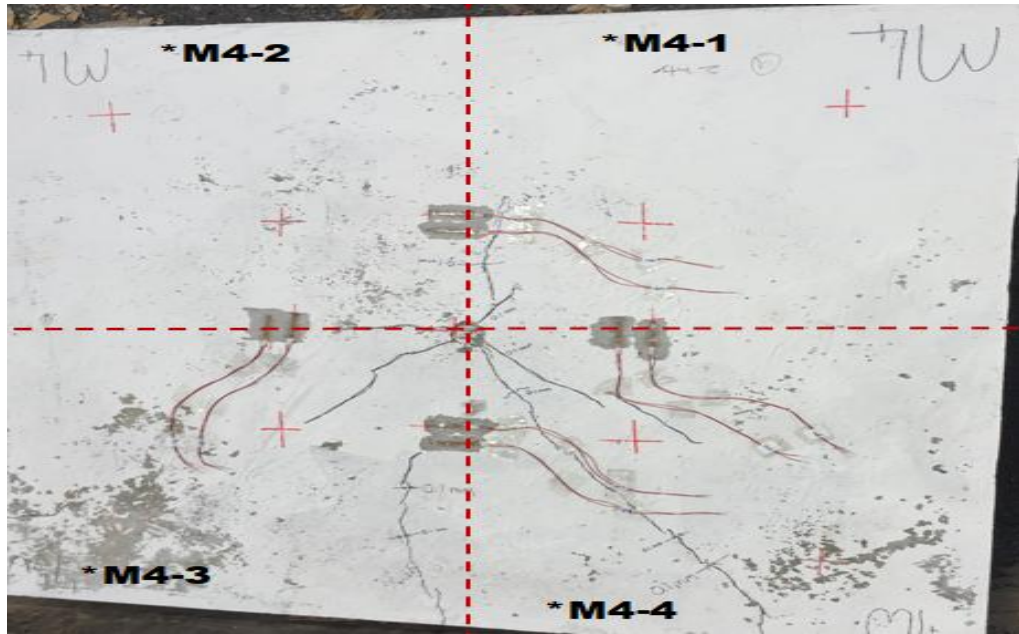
Failure for Slab Specimen M4 (2m drop) – another plan view
